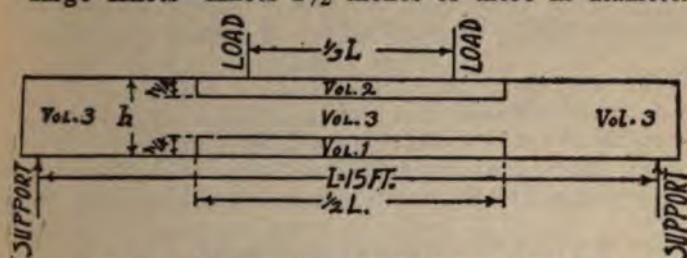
Diagram Showing Method of Locating Defects in Stringers
